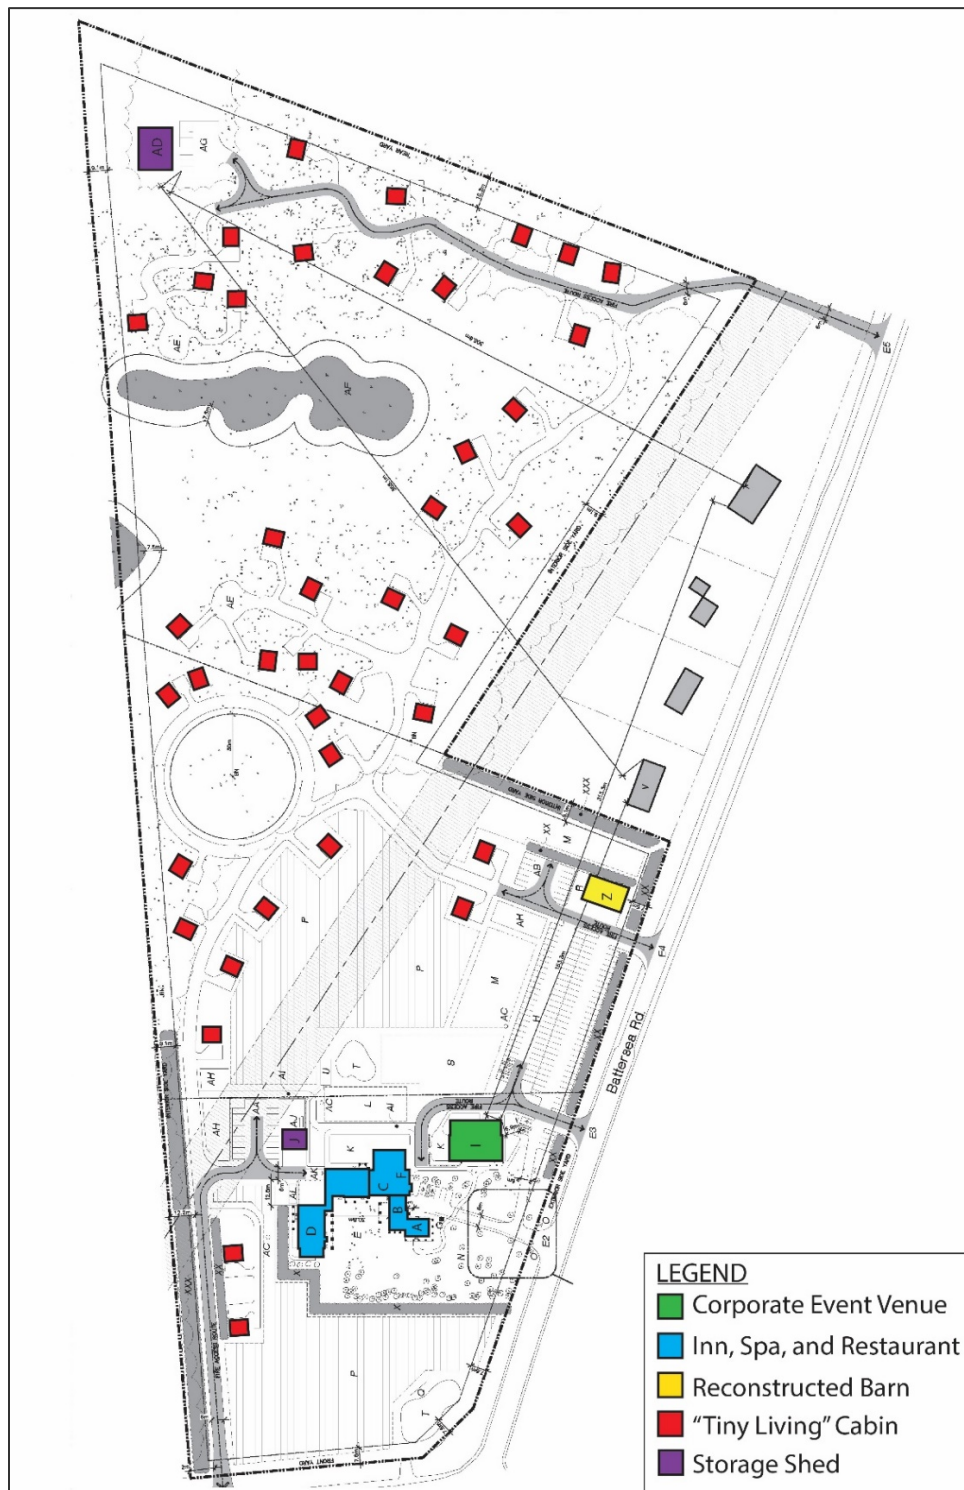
Proposed Concept Plan (source: Shoalts and Zaback Architects Ltd.).
